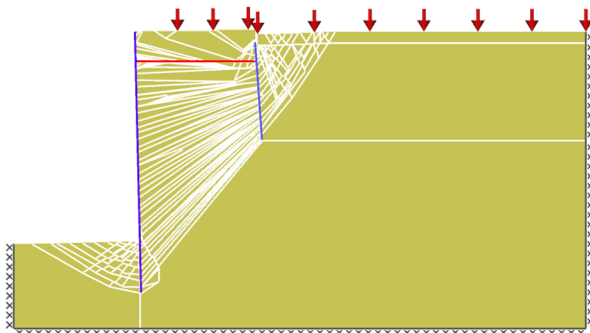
Failure mechanism with anchor plate positioned so close to the wall that it is ineffective and has become part of the wall failure mechanism.
